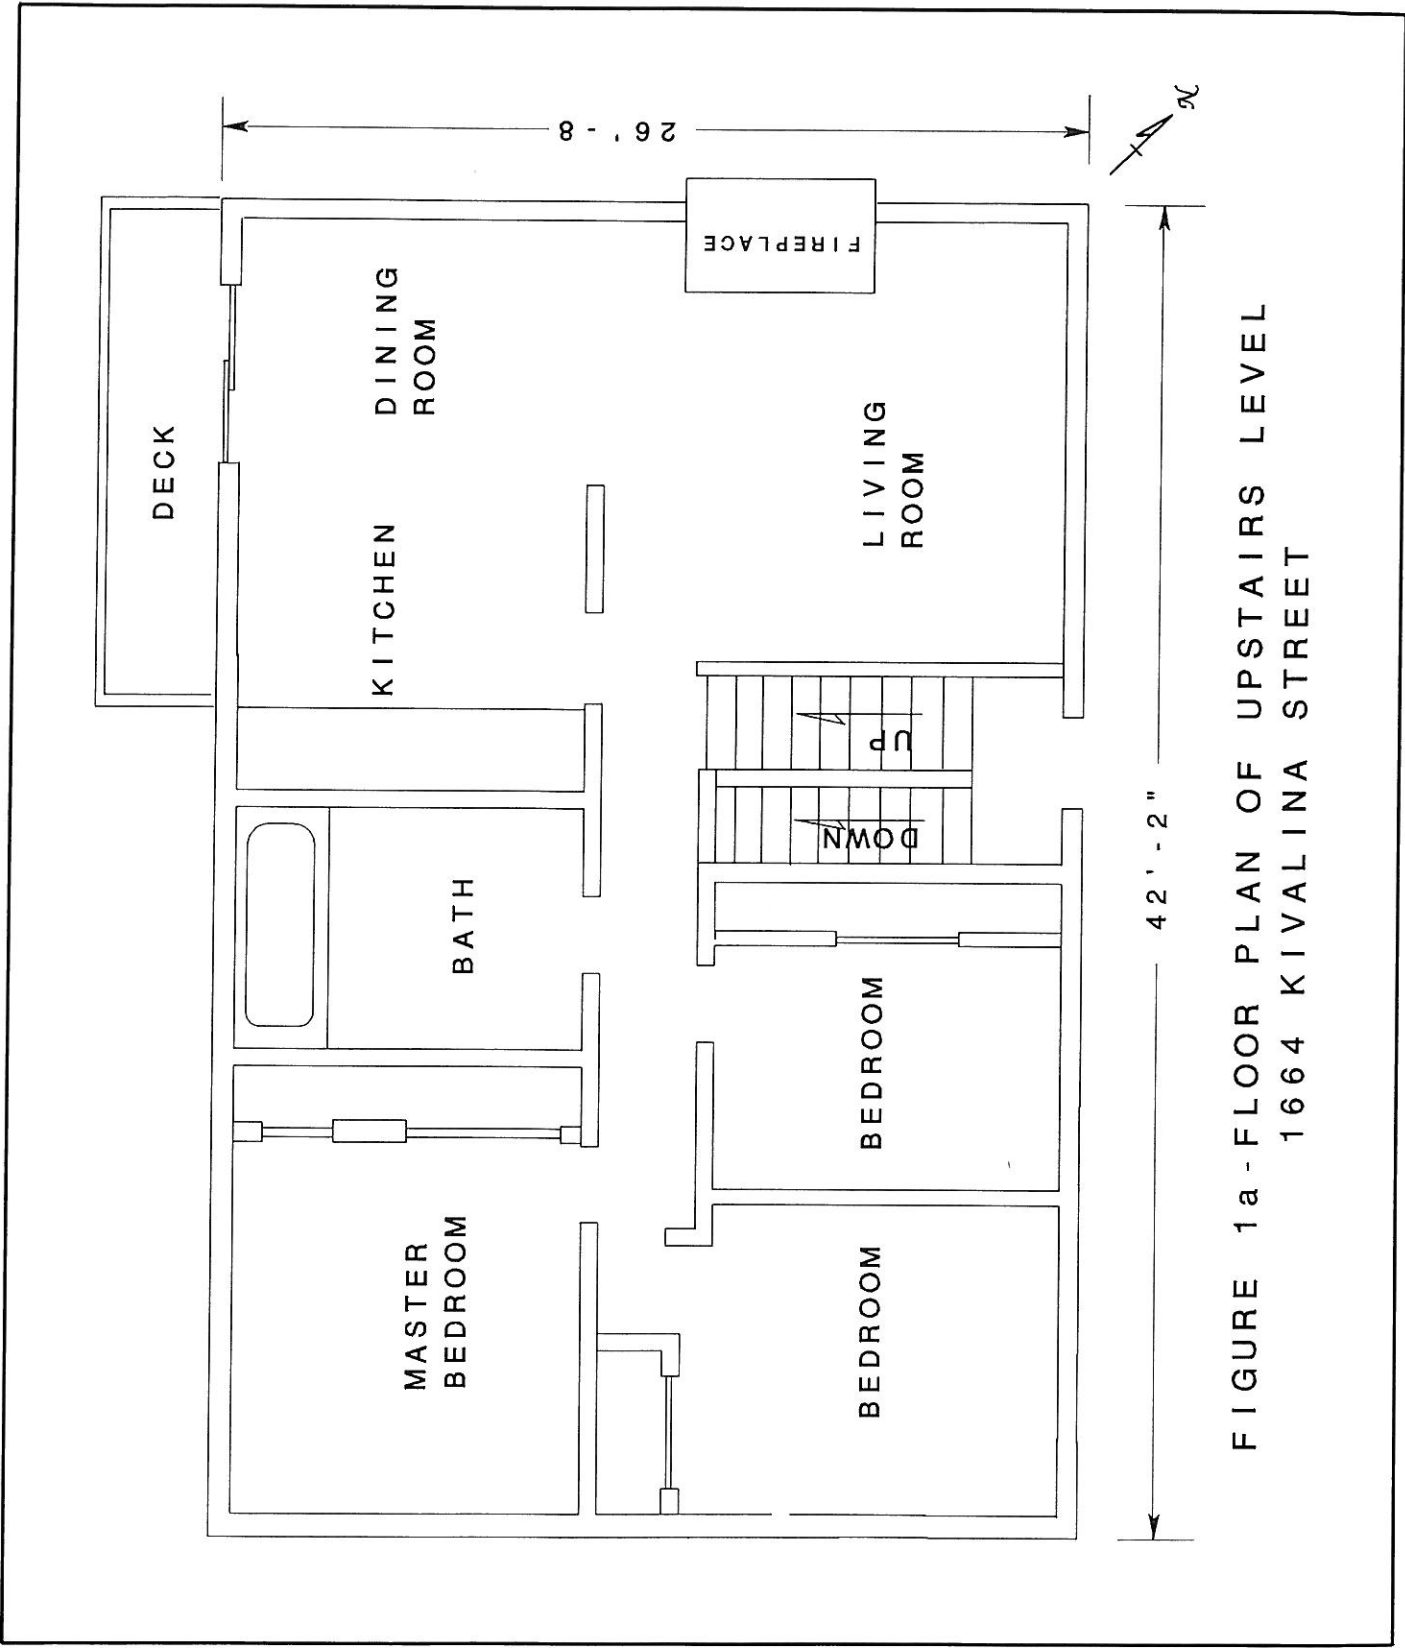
FLOOR PLAN OF UPSTAIRS LEVEL
